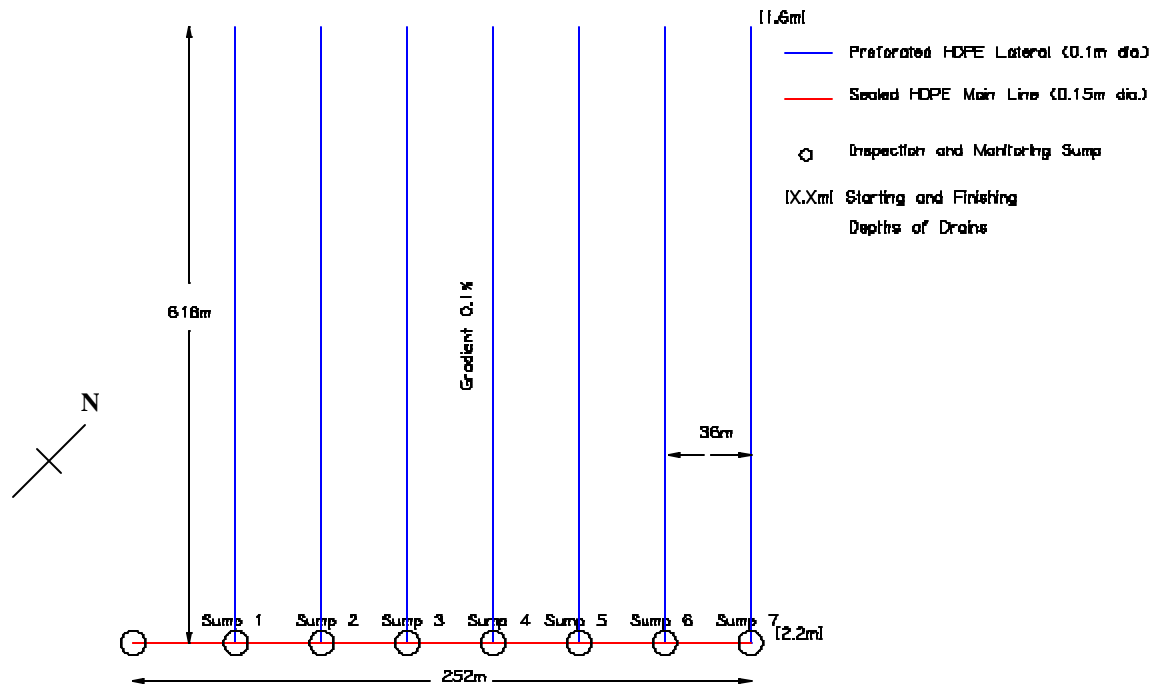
Plan view of subsurface drainage system installed at the CWM site
